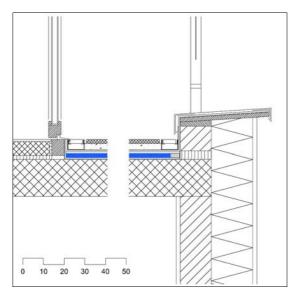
shows the joint of a VIP insulated terrace to balcony glazing with wood framing.
